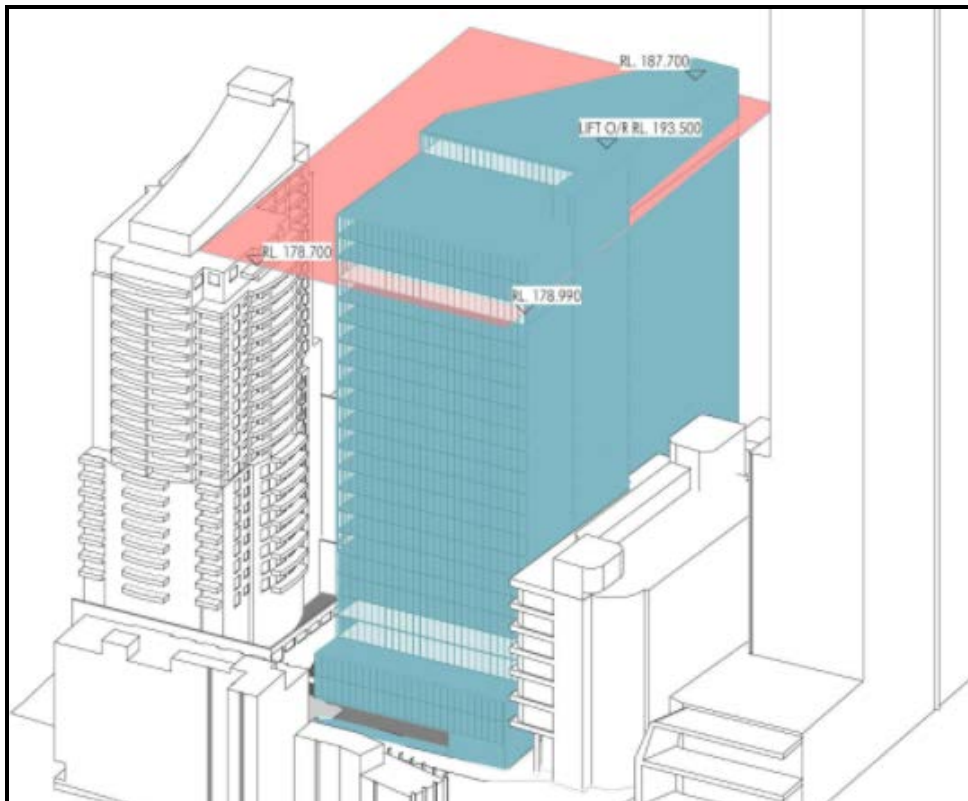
Proposed building envelope viewed from south (extract from architectural plans)
